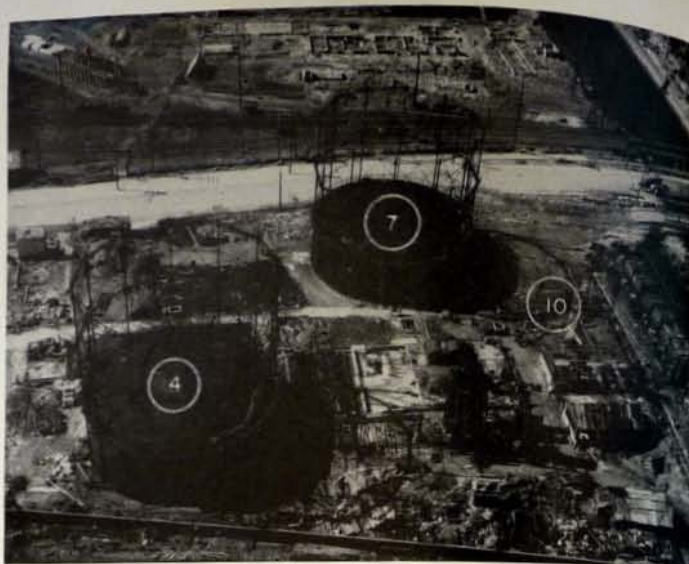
6,400 feet from GZ. Group 41. Aerial view looking west at Kyushu Gas Works.
